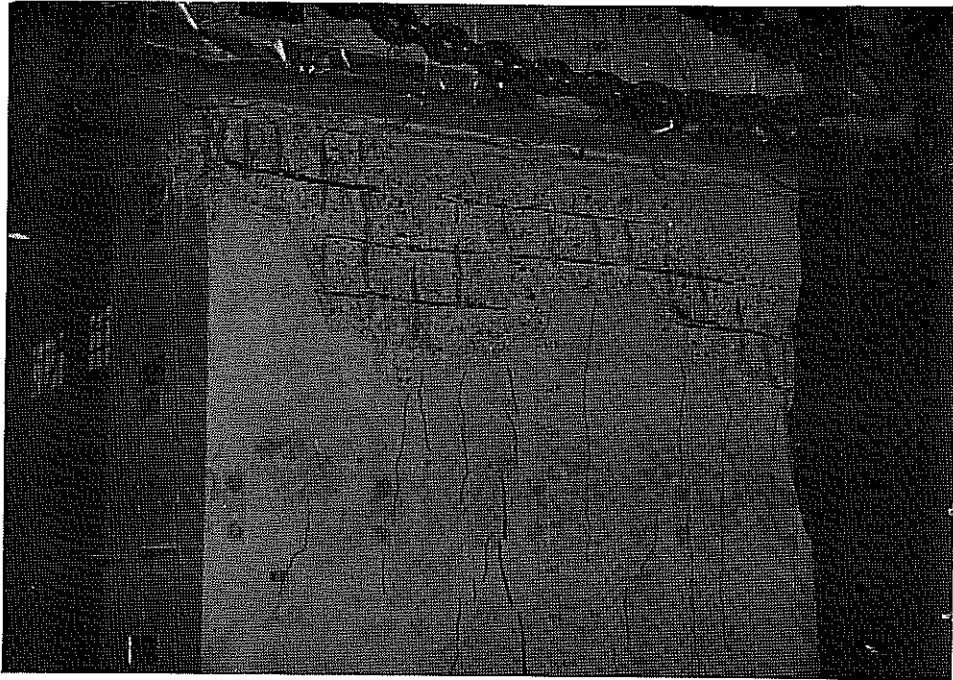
Specimen 1M10 Compression Flange Close-Up
